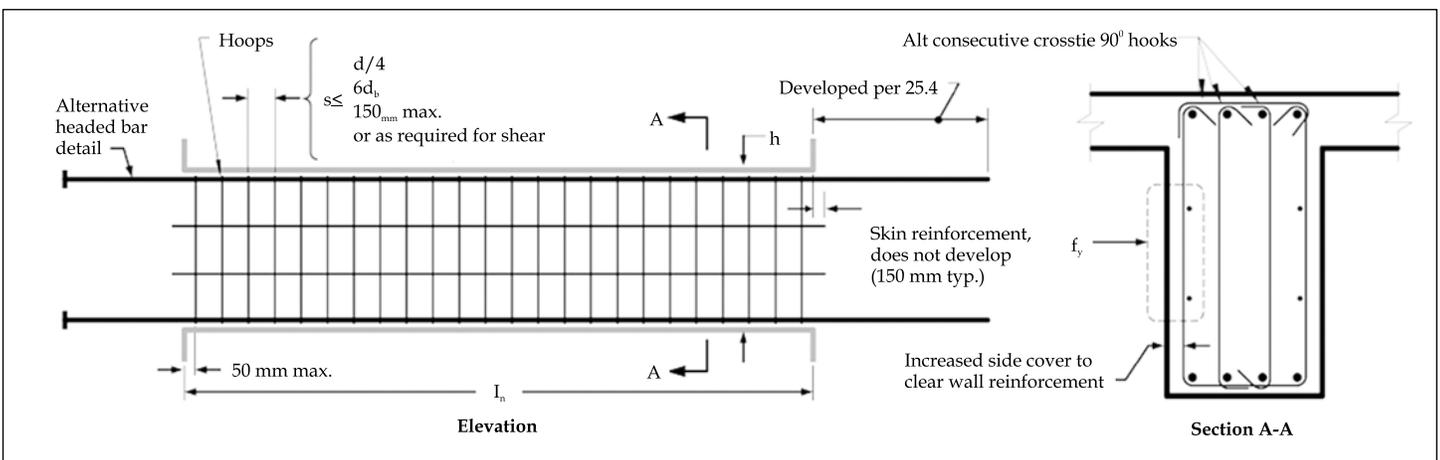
Details for conventionally reinforced coupling beams as per ACI 318-14 (Source: Moehle, et al. 2011)
